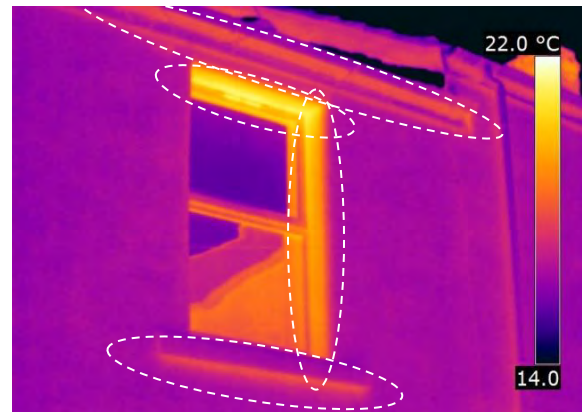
Thermogram of first floor window and eaves for Case study A after installation of EWI
